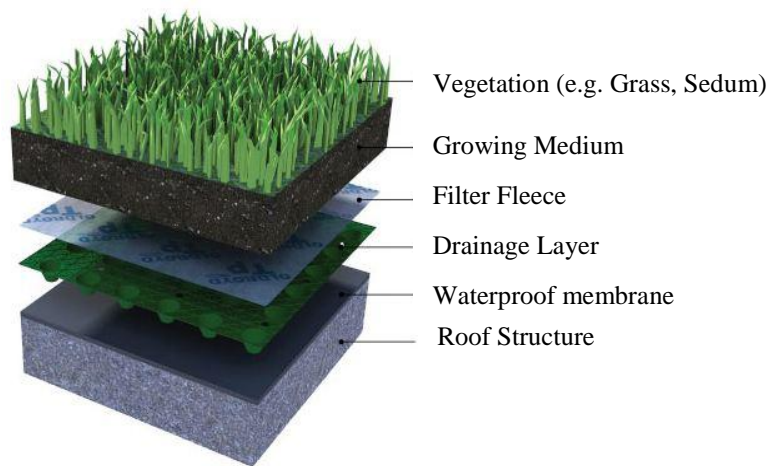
Structure of a modern Green roof (adapted from Oldroyd, 2010).
